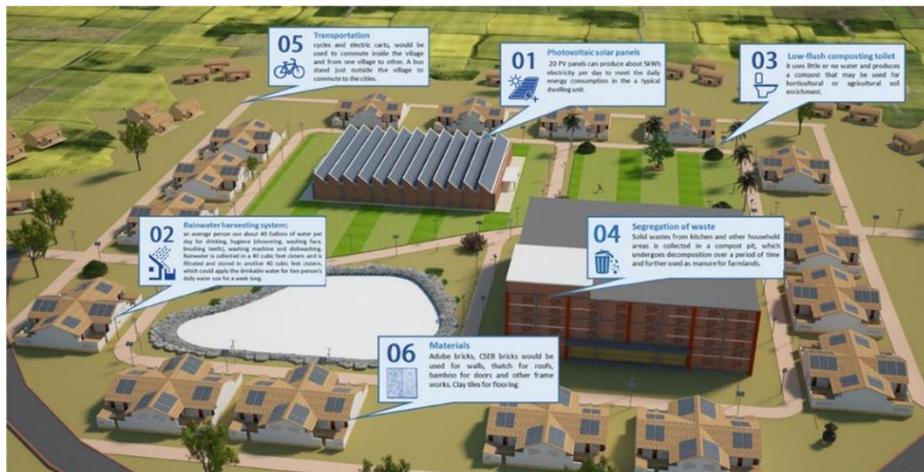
Bird's Eye View of the Proposed Village. Source: Author
